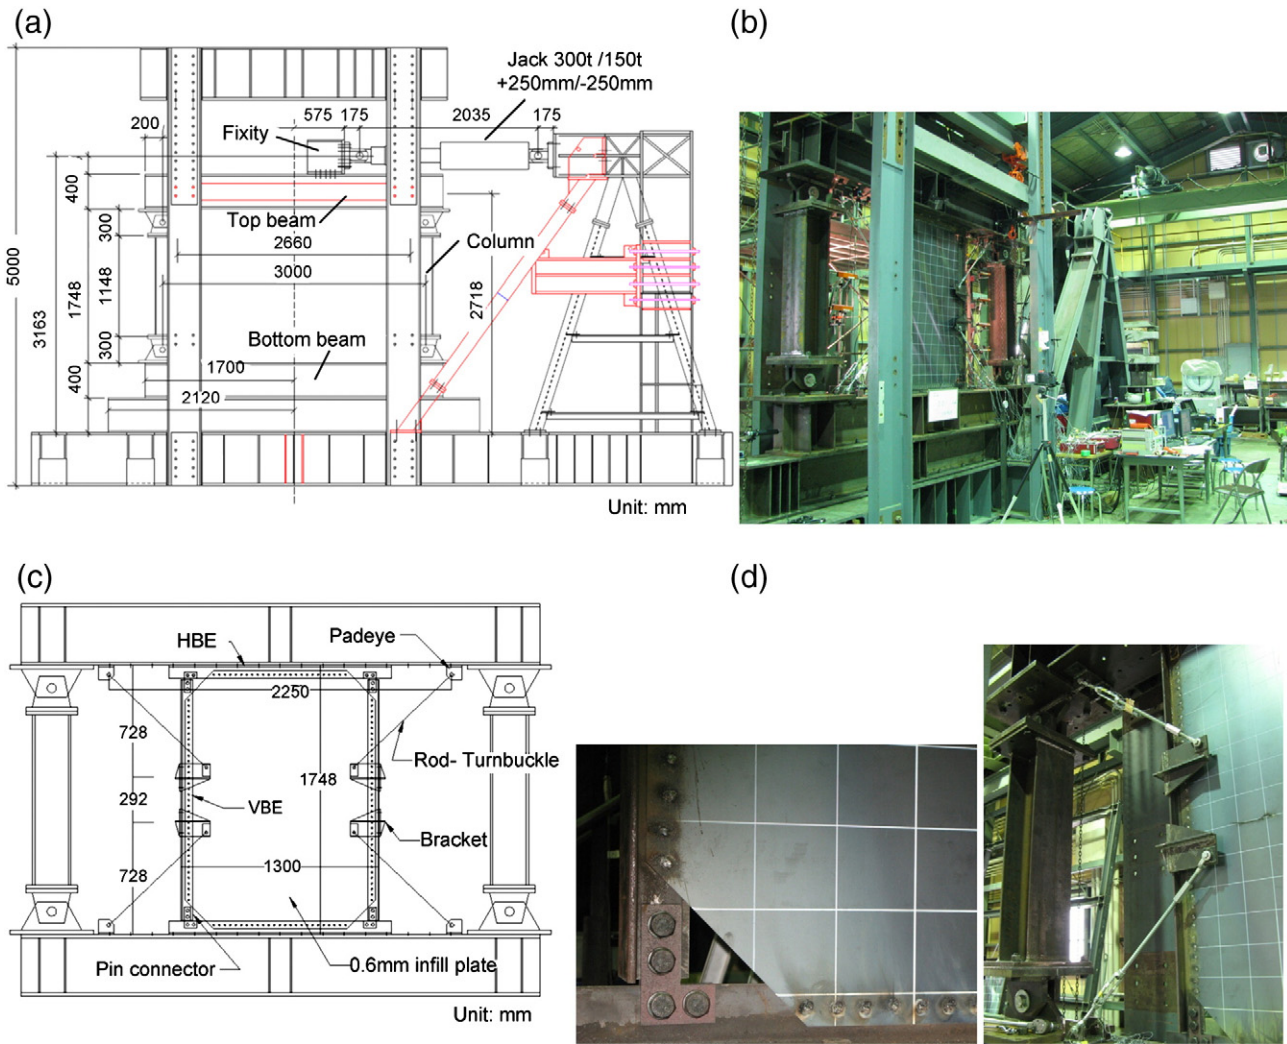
Experimental setup: (a) loading frame; (b) photo of entire setup; (c) dimension of specimen with tension bracing; (d) (left) photo of pin-connector, (right) photo of tension-rod and bracket.
